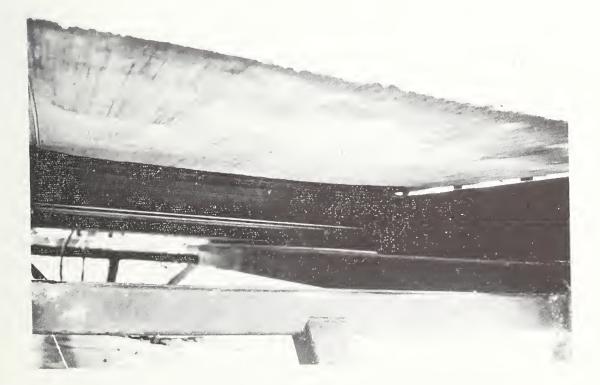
UNDERSIDE OF SLIPFORMED SLAB
